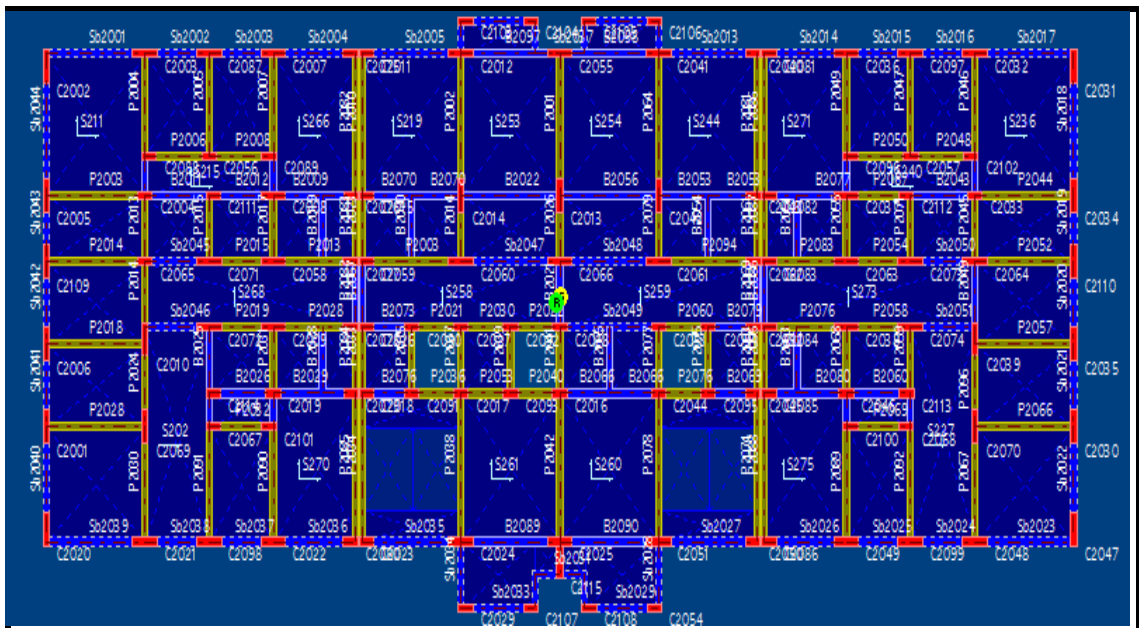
Plan of Two Stories with Tunnel Formwork System
